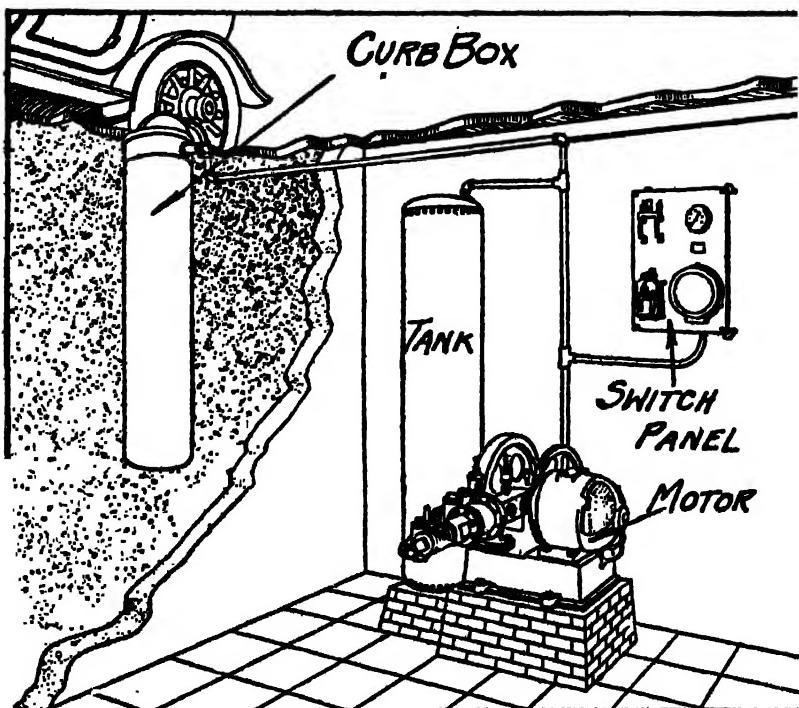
Sectional View Showing Hale Curb Box Installed with Automatic Air Compressor and Storage Tank.
